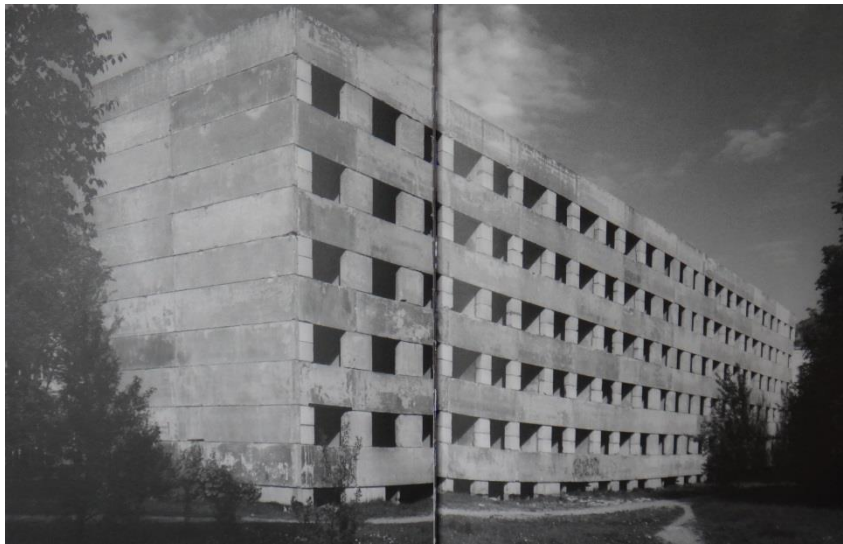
Abandoned concrete building in Lasnamäe, Tallinn, Estonia (Forty 2000: 154)
